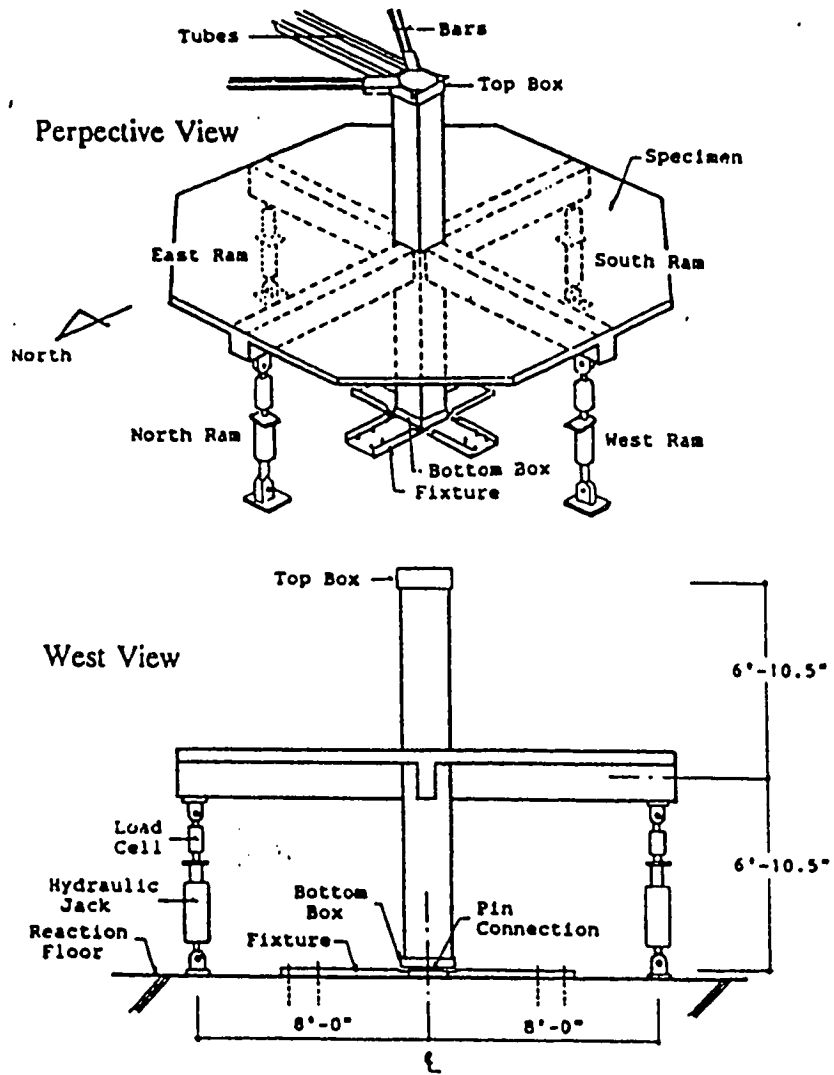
Strengthening by the Use of Concrete Jackets, Test Setup, Ref.[19].
